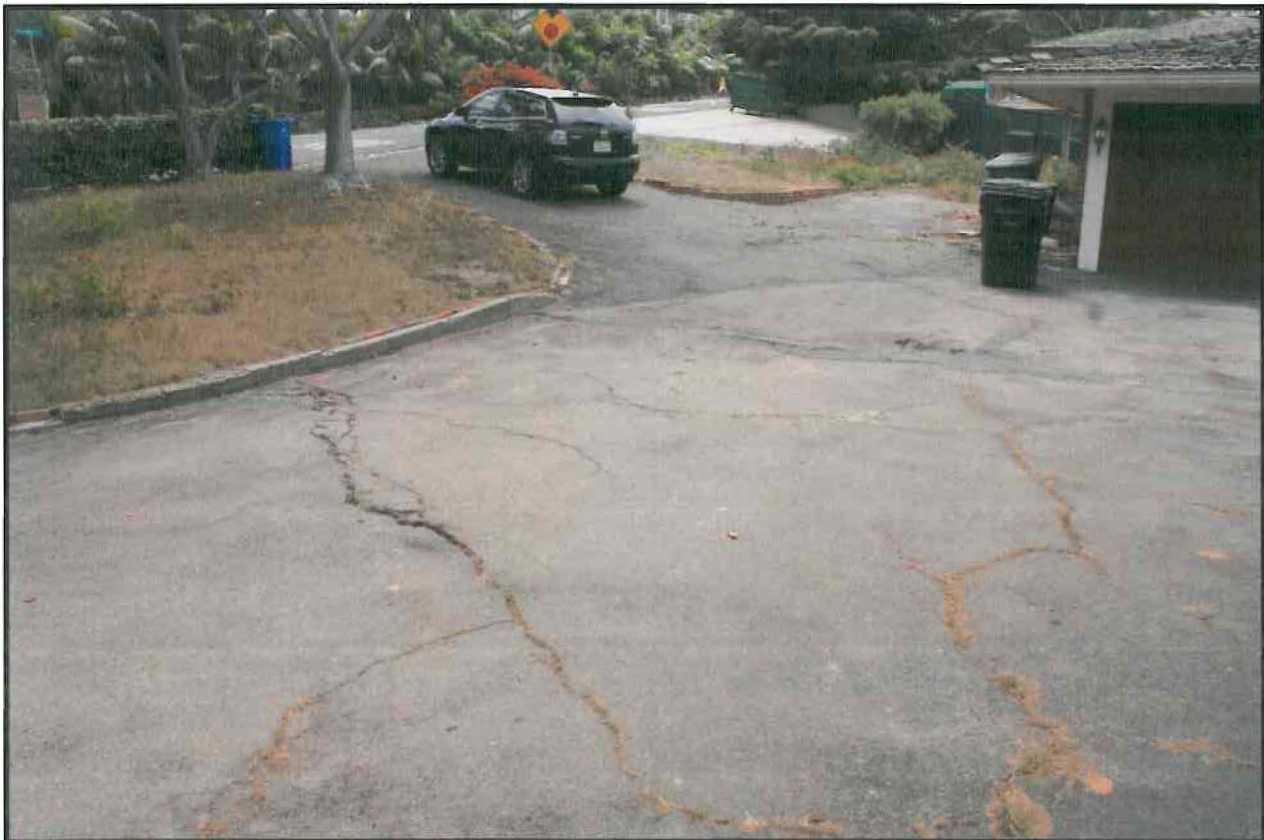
Photo B - Current photo showing new circular drive addition and break in original brick/block border.
